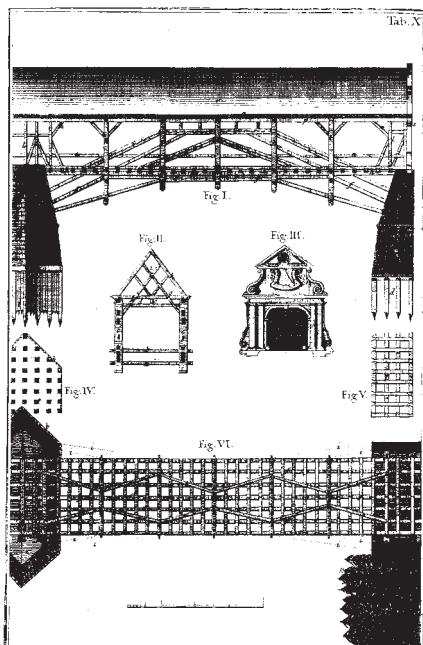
(left): A truss bridge with mainly beam action. Only the vertical members receive tension as hanging elements
